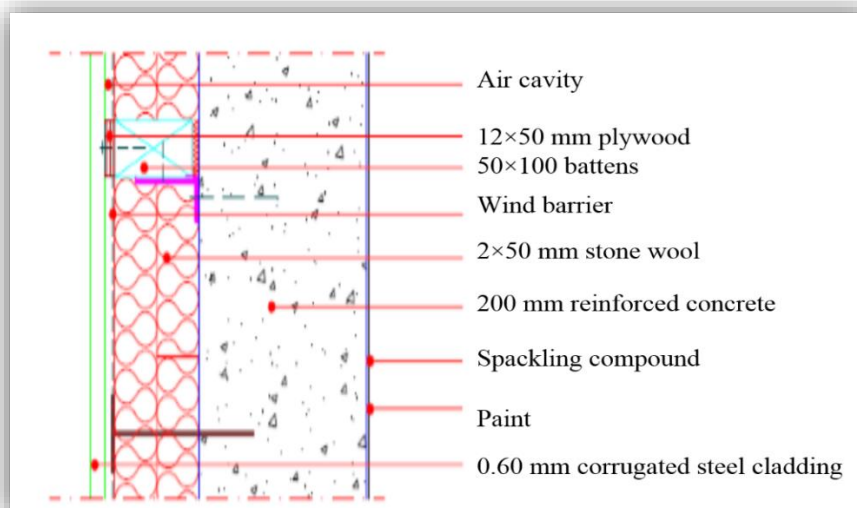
Cast-in-place reinforced concrete wall insulated outside and cladded with corrugated steel
